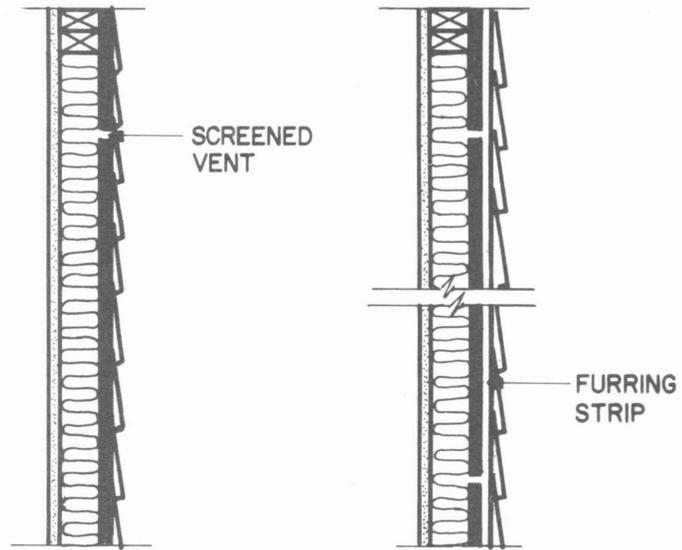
Methods of providing wall cavity ventilation for homes with wood siding. All openings should be screened to prevent insect entry.
